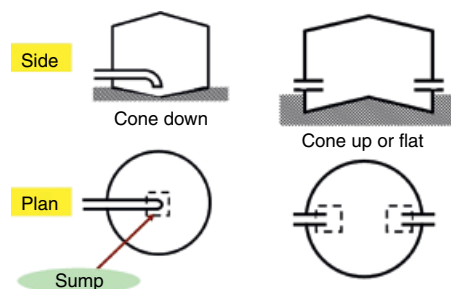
Drain valve arrangement for cone-down and cone-up floors.
